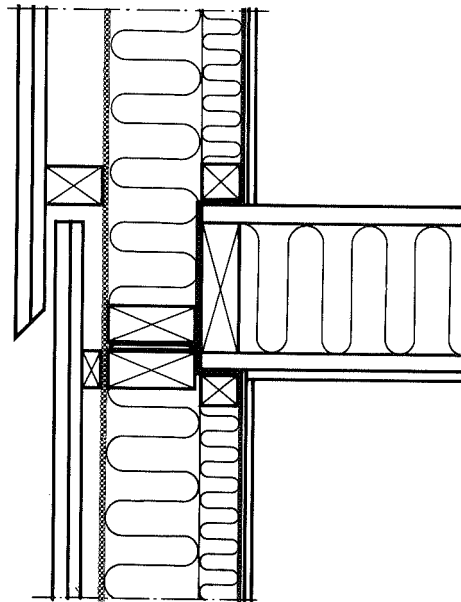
The joint between gable head, gable wall and intermediate joist structure in a wall construction with an internal horizontal framework system. The assembly procedure is shown in figure 54.
